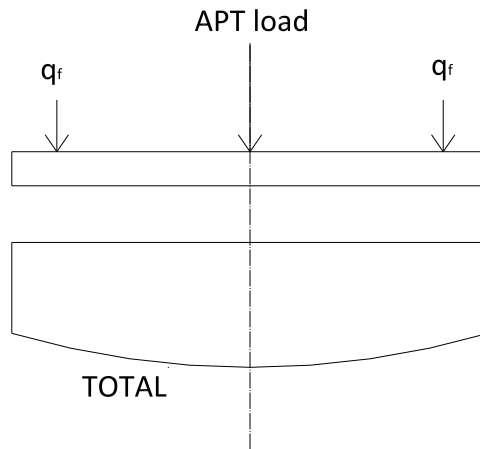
Transverse position of loads and resulting Massonnet-Guyon-Bares transverse load distribution (bridge crossed in the center of the roadway)
